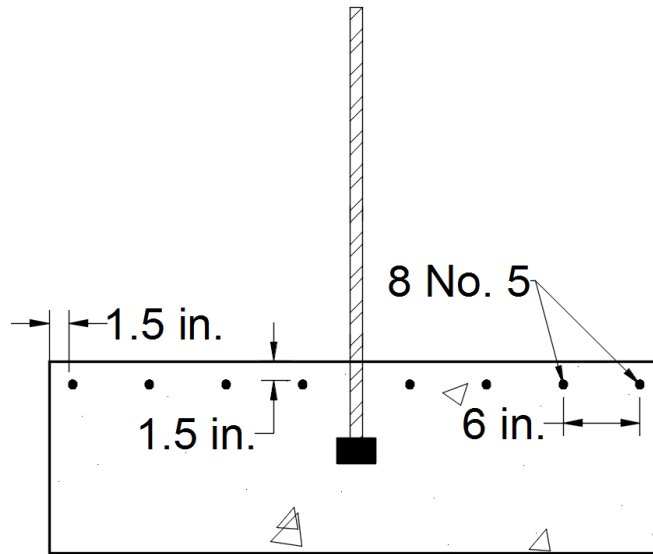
End view of shallow embedment specimen with 8 No. 5 bars as flexural reinforcement.
